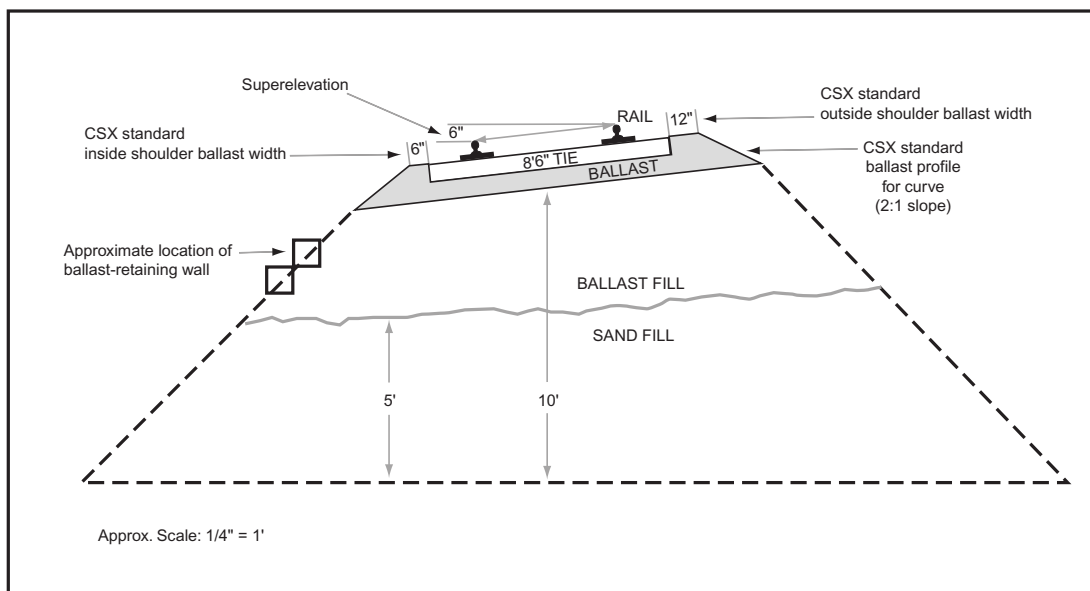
Conceptual drawing of cross section of the roadbed in the accident curve showing the estimated location of the ballast-retaining wall, as well as some roadbed, track, and ballast section elements.
